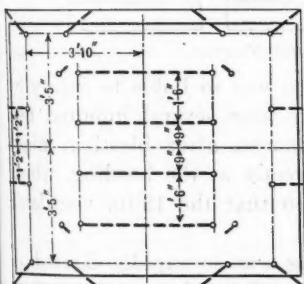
METHOD OF DRILLING HEADINGS, MOFFAT TUNNEL.
